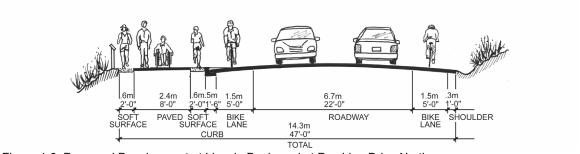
Proposed Development at Lincoln Boulevard at Pershing Drive North
